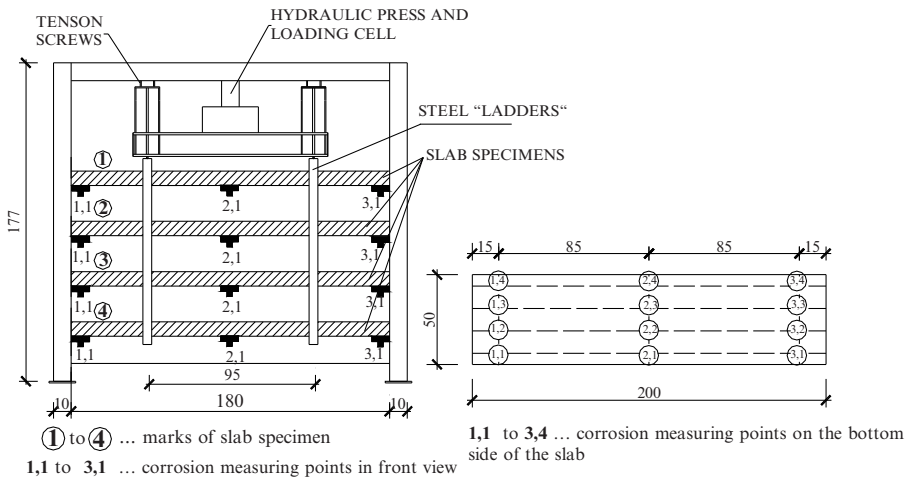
Slab specimens in the testing frame and points of corrosion measurement
